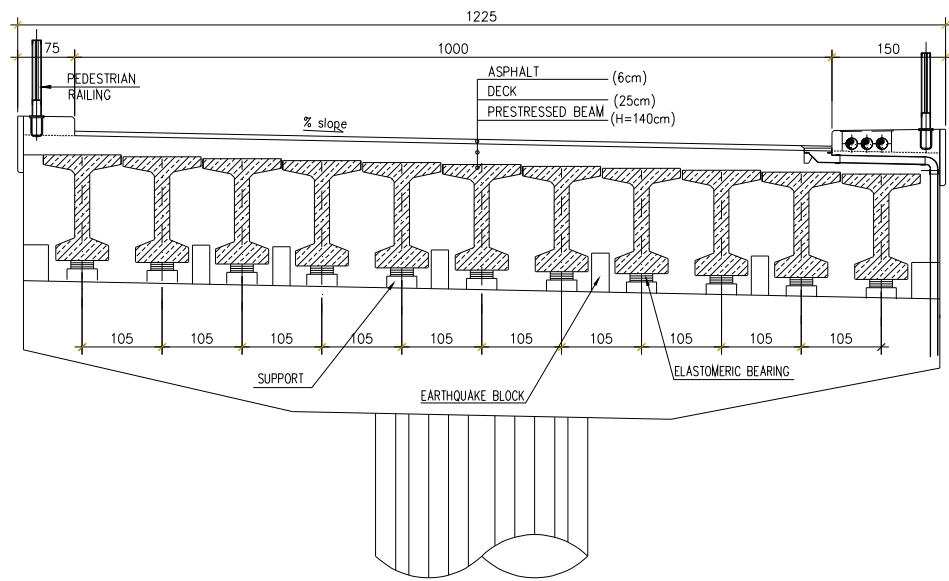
Bridge Cross-Section for Span Length of 35 m
